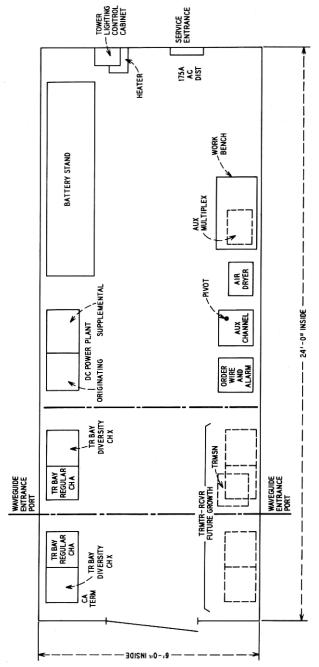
Floor plan layout for a TH-3 repeater station in a standard shelter.
